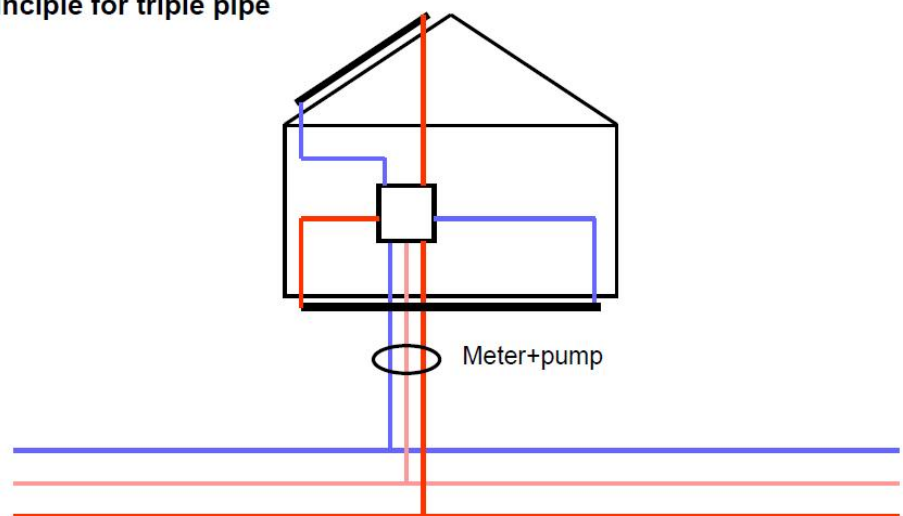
Solution with triple pipe for connecting the building to the DH network, Ramboll (2010a).
